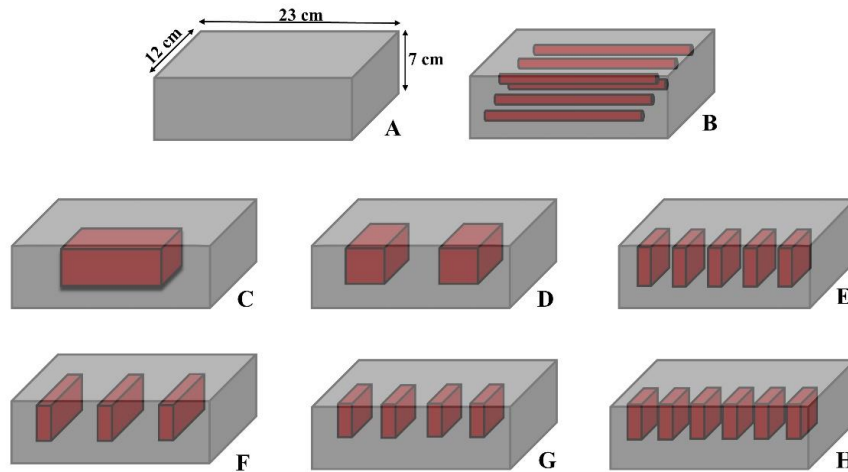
Schematic for PCM capsules incorporated concrete bricks
